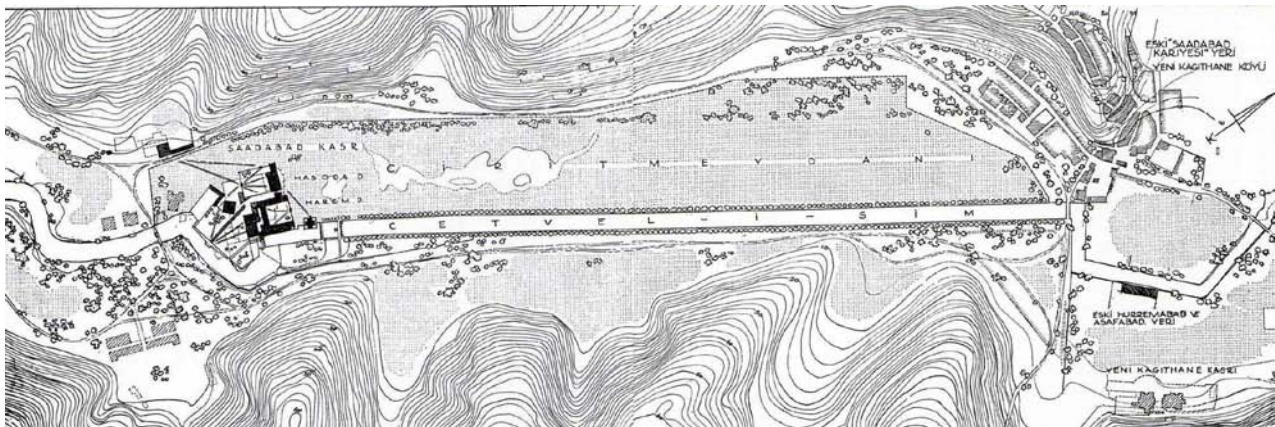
Site plan of Sadabad Palace (Eldem 1977)
